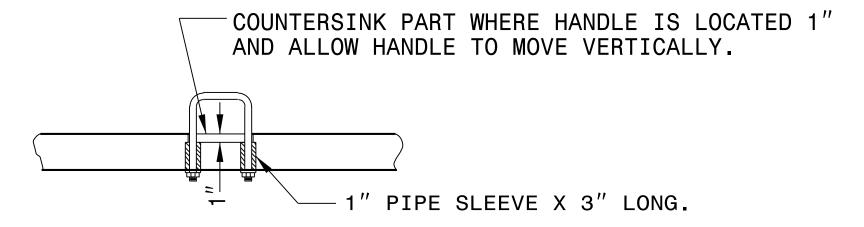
DETAIL INTENDED FOR NON-TRAFFIC BEARING DRAINAGE STRUCTURES.
